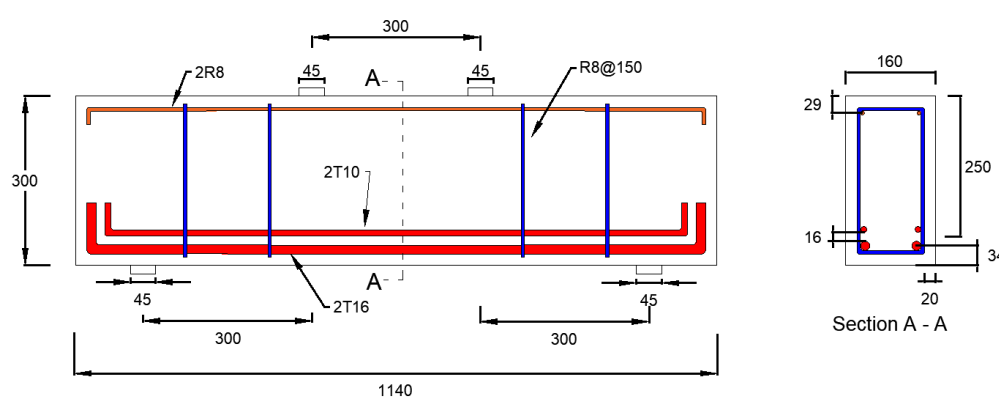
Detailing and Geometry of Control Beam, C-01.
